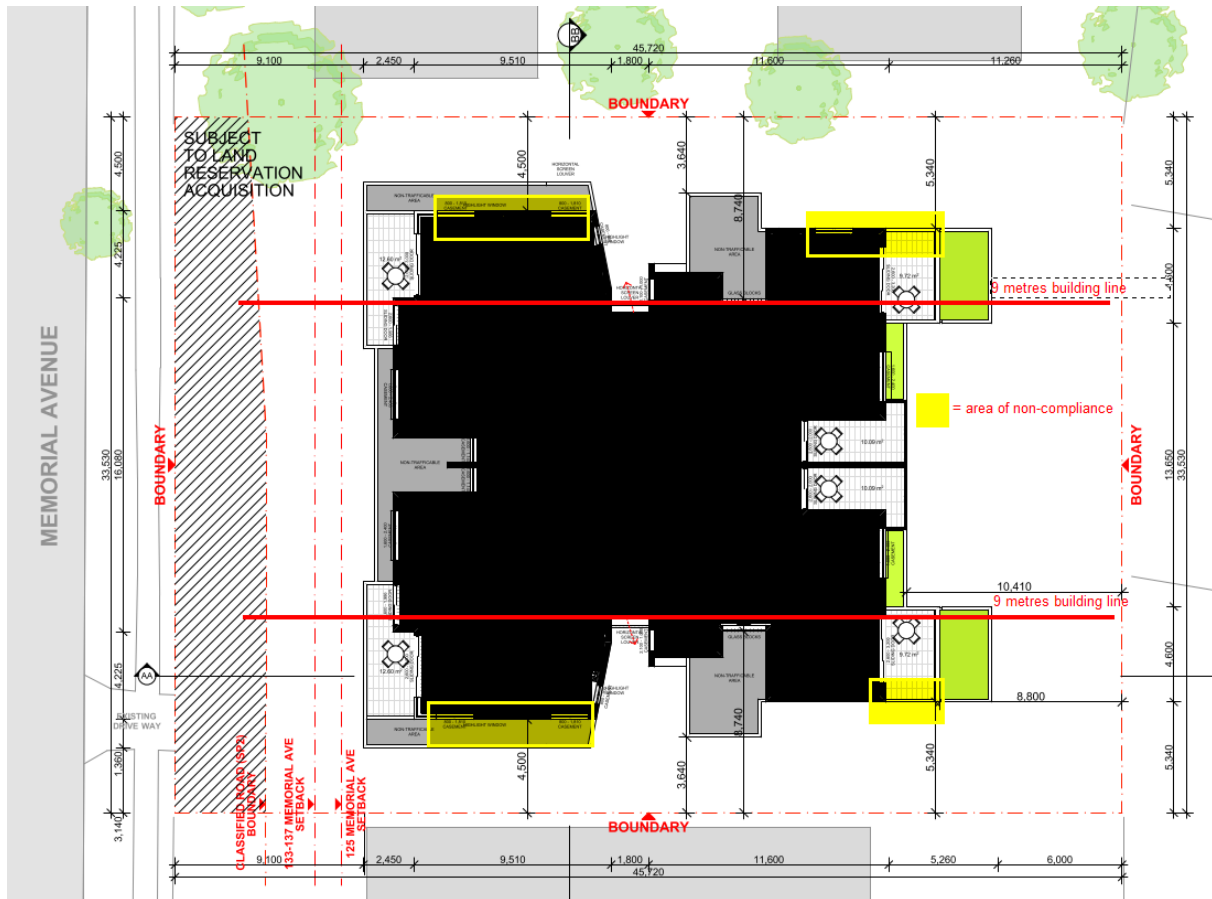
Extract of the floor plan that shows the extent of non-compliance with Building Separation on Level 4
